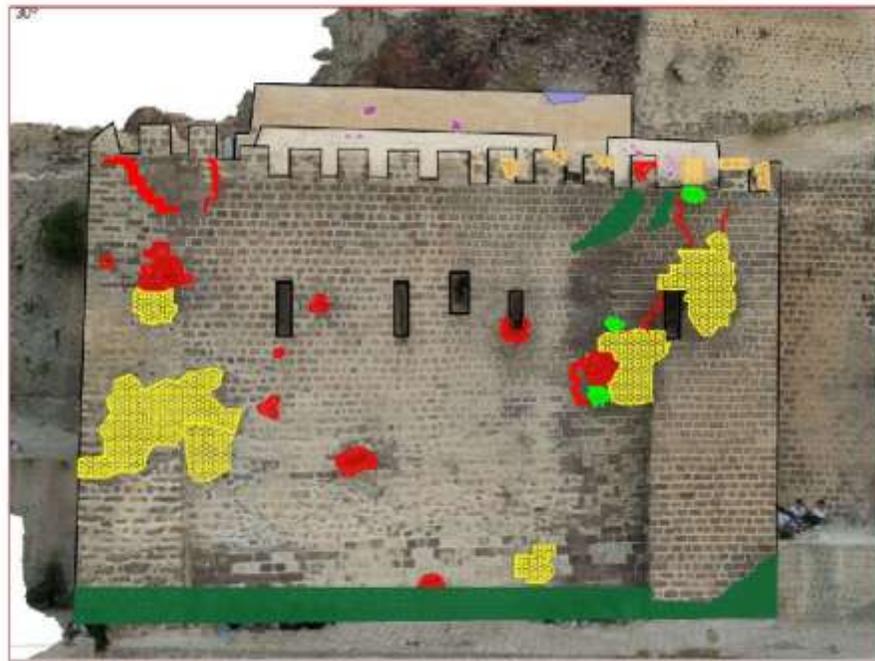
shows the damages on the Northern Facade of the Northern Tower.
